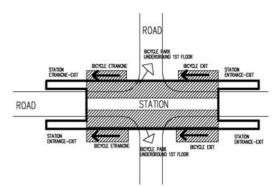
Bicycle-rail transit-tube interchanging transport system patterns in General distribution station on the 1st flood underground.
